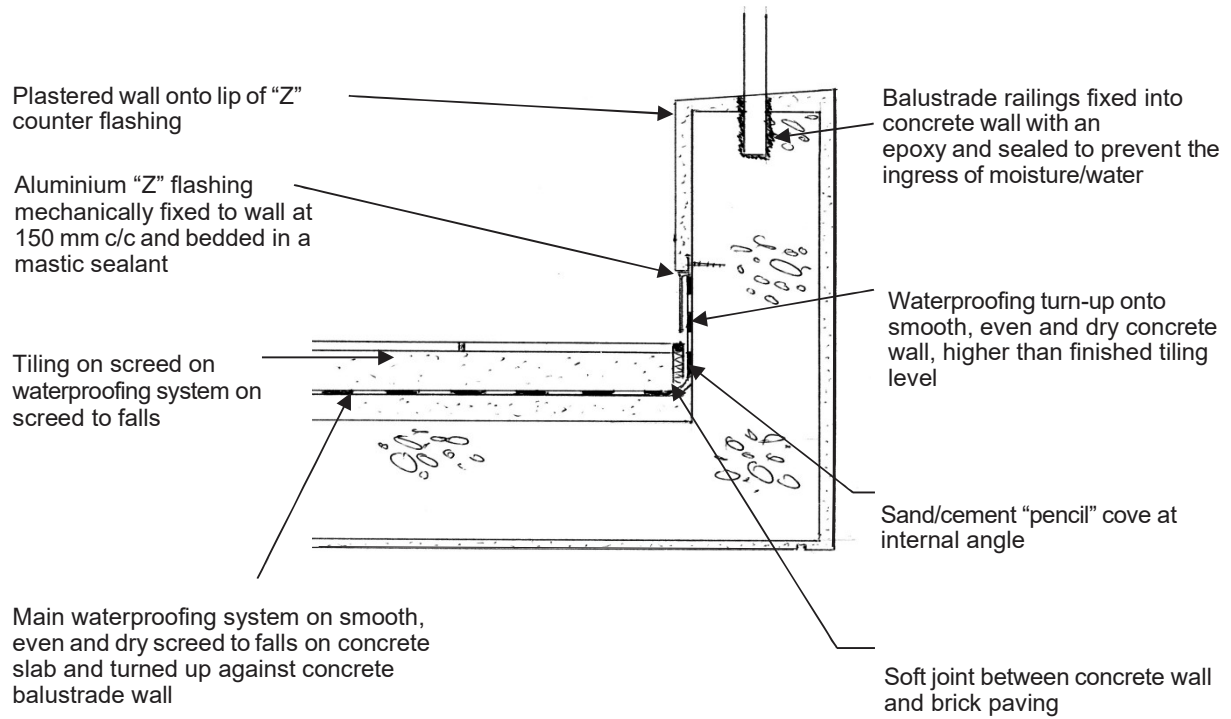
Waterproofing turn-up detail at concrete balustrade wall on balcony or against concrete wall
